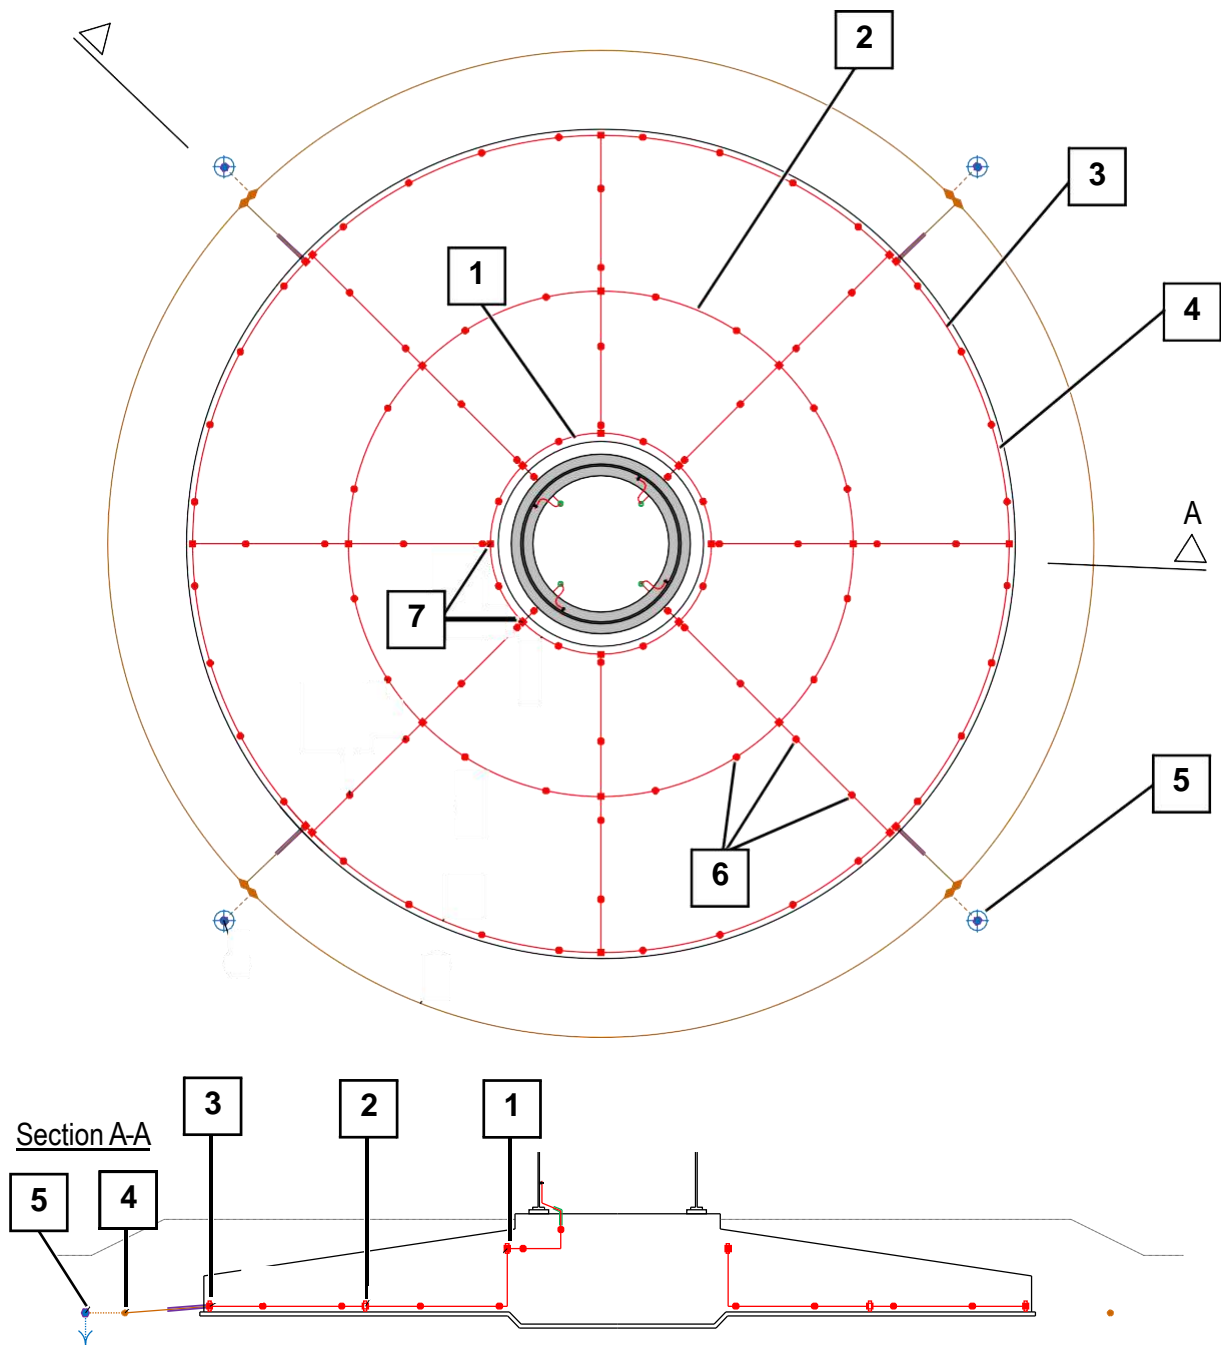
Overview of tower base lighting detection system - plan view of tubular steel tower foundation
